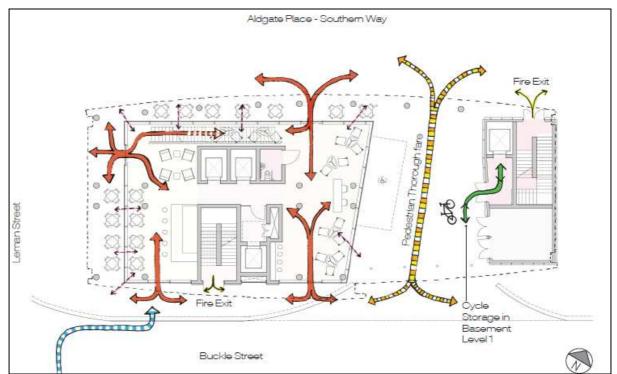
Ground floor plan view of the pedestrian link through the building between Buckle Street and Aldgate Union
